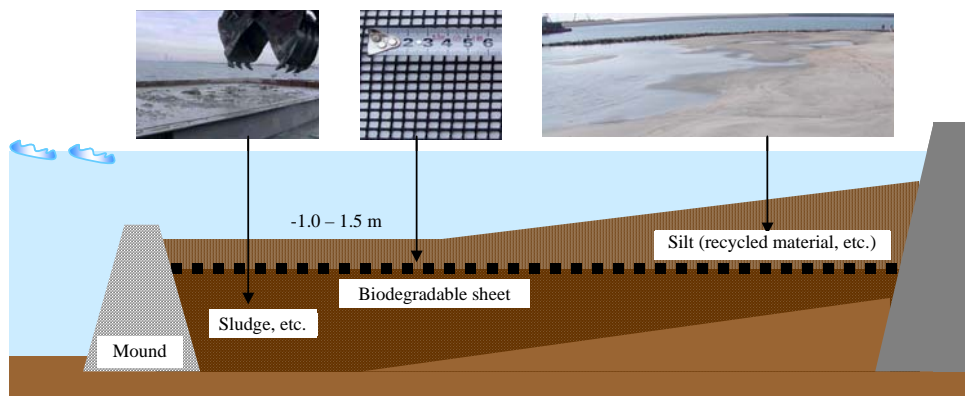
Schematic diagram of cross-section of ECOFLAT construction method.
